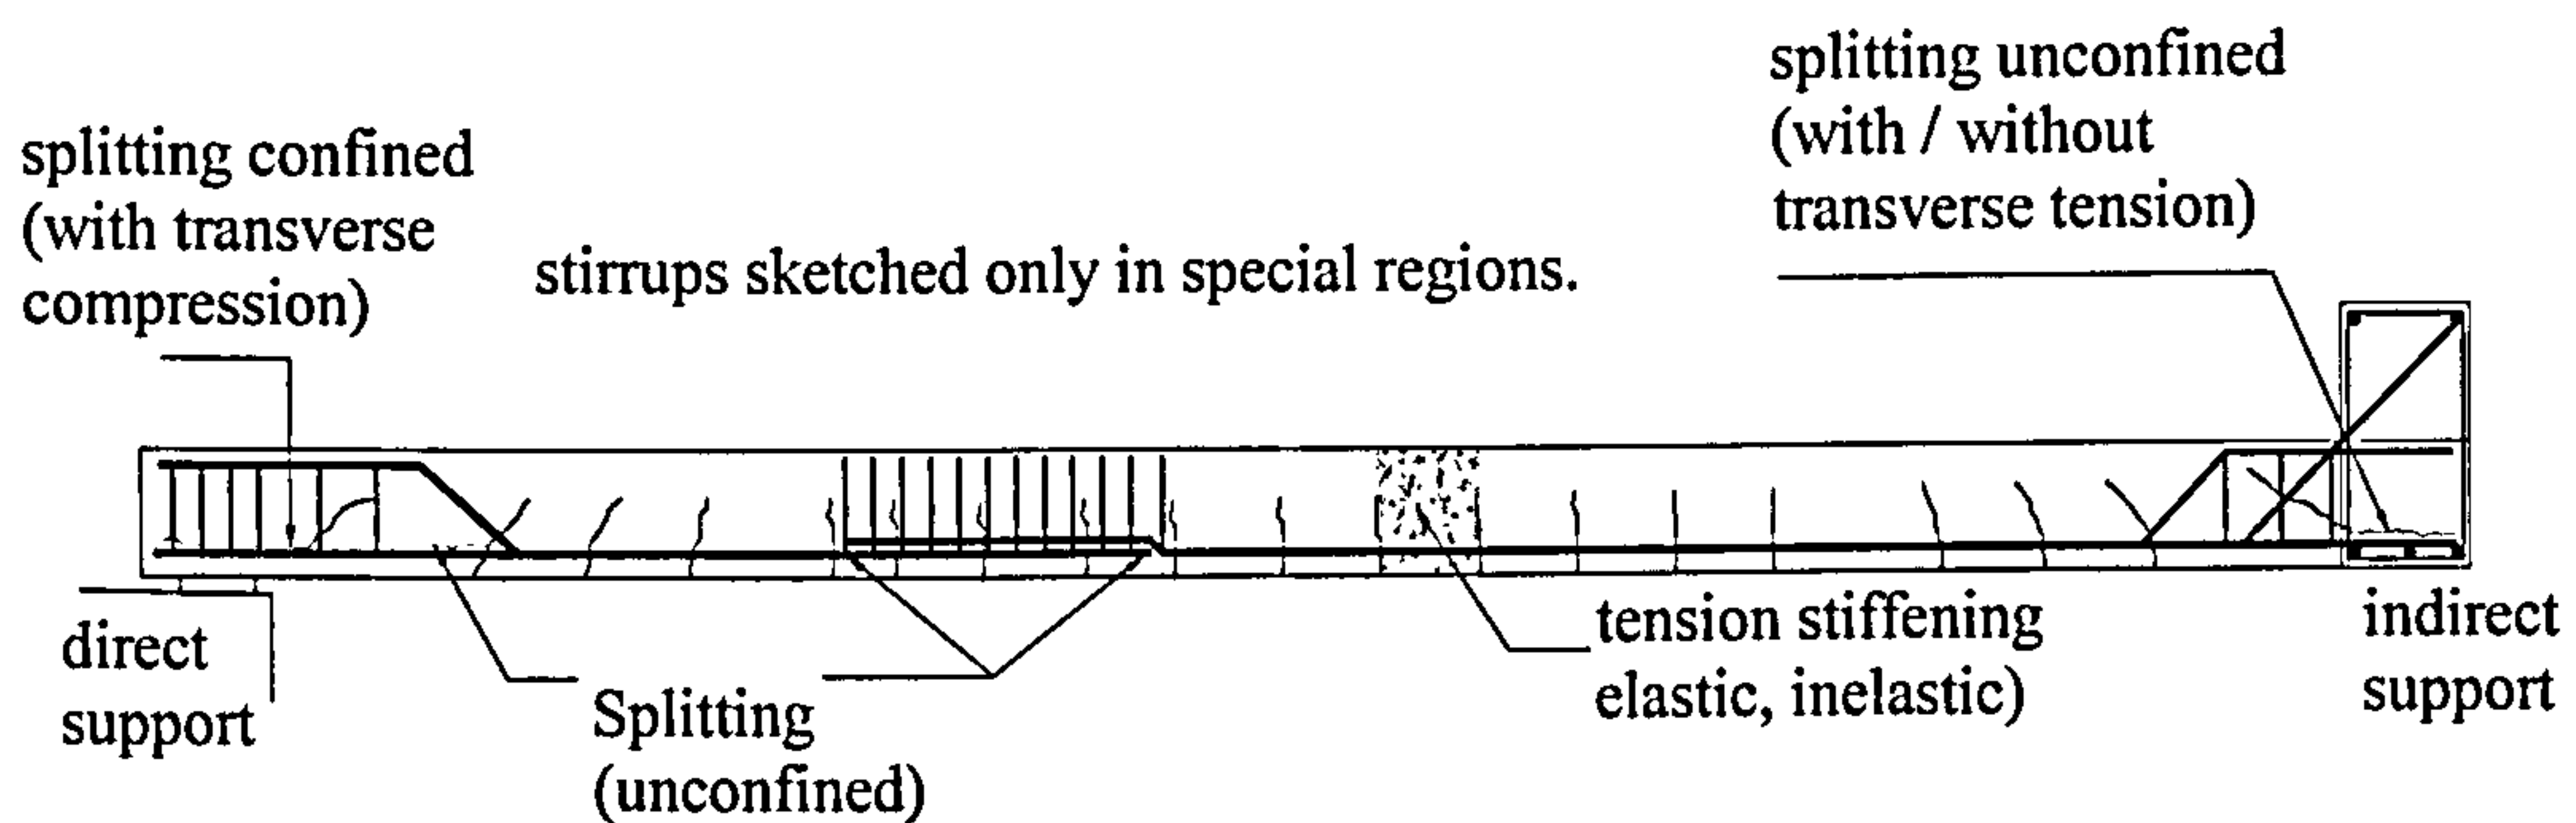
Typical bond problems in RC beams (*fib* 2000).
